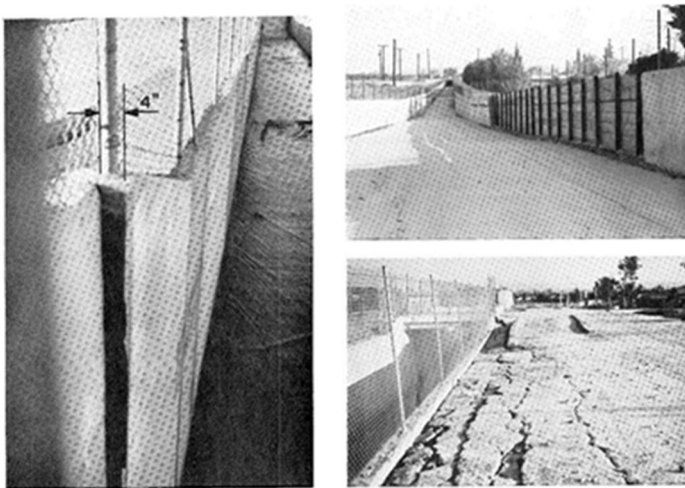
Failures at retaining channels' walls (Wood 1973).
